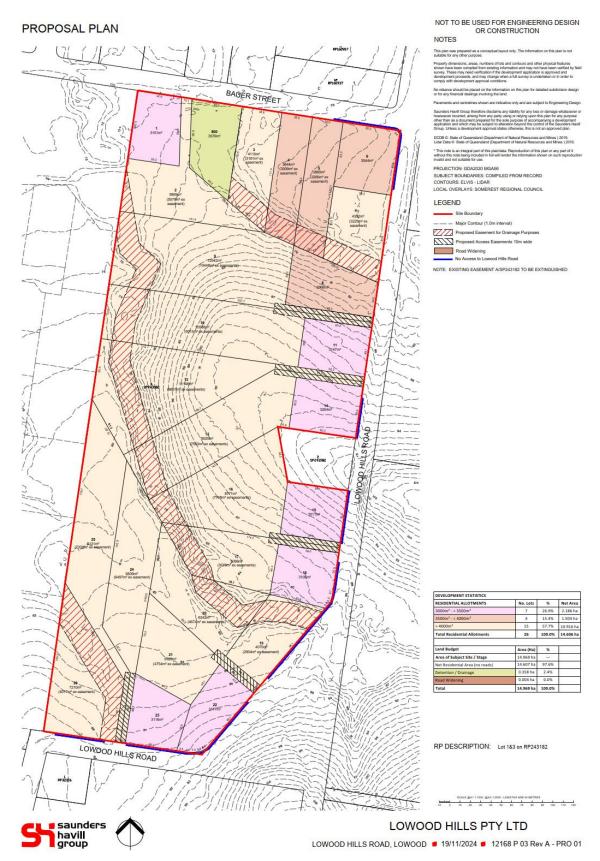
Concept Layout (Source: Saunders Havil Group 2024)
